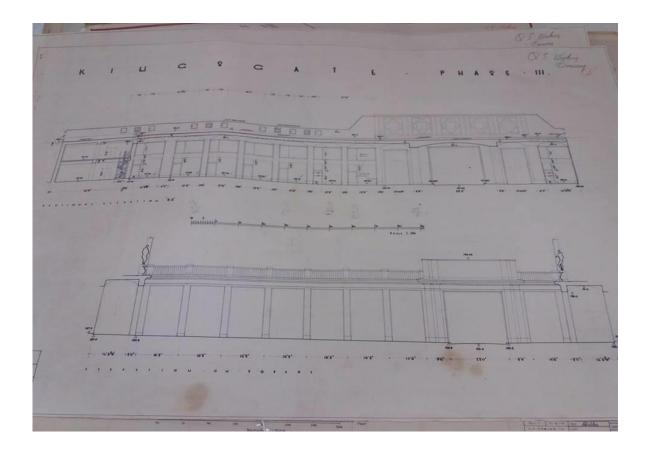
The plans by Alviro Bergonzo for the 1964 City Gate Source: Works Department – Project House
